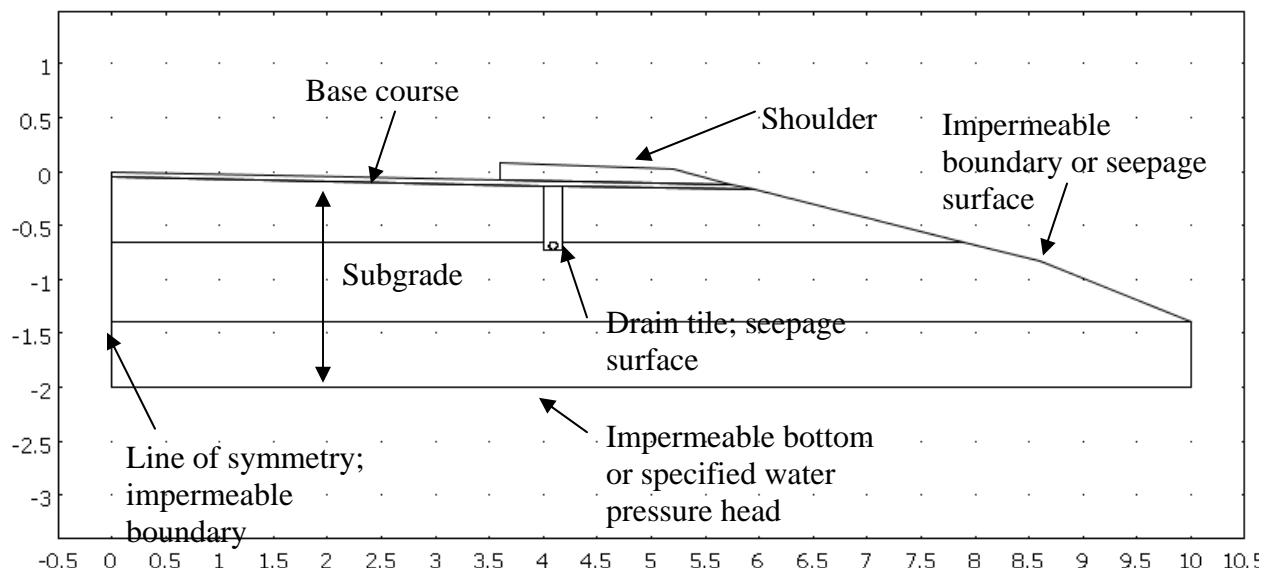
Typical cross-sectional view of edgedrain geometry
